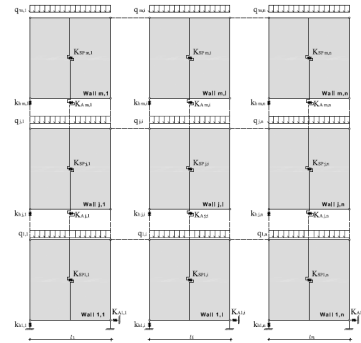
System of $m \times n$ walls modelling a full-scale building.
